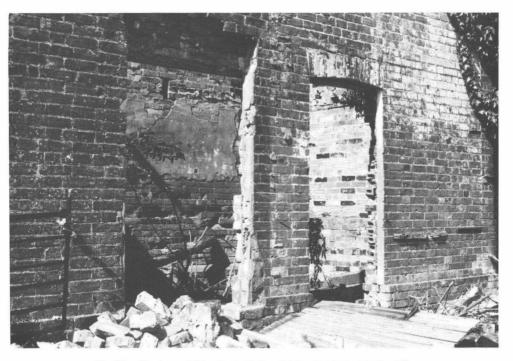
Stockwood Firs Oast: Hollow Lining Bricks inside the Kiln.
